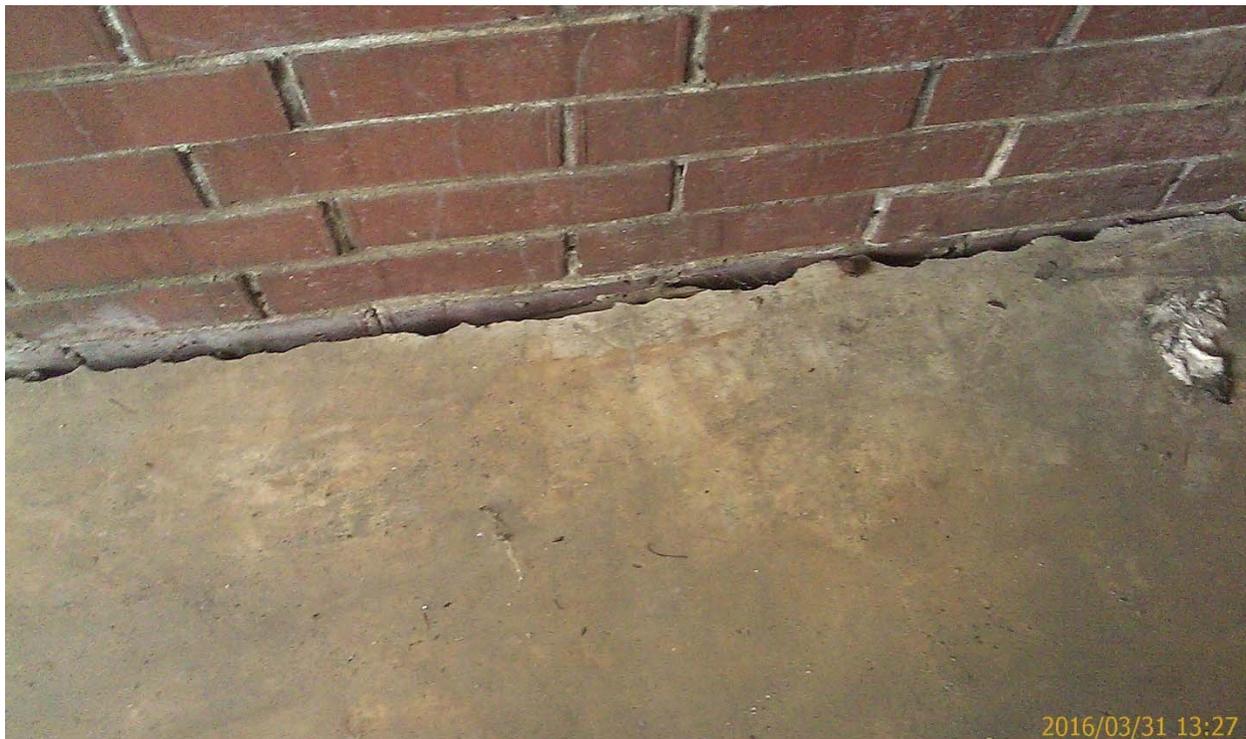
Gap between floor slab and eastern wall of Leather Trimmings building.
